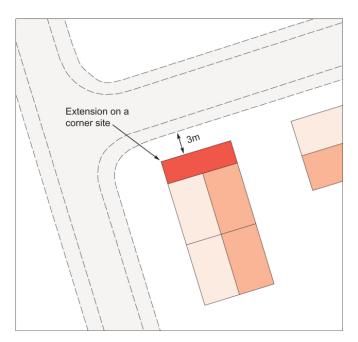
Extensions on a corner site should keep the building line of the streets and there should be a distance of at least 3m to the edge of the pavement.
